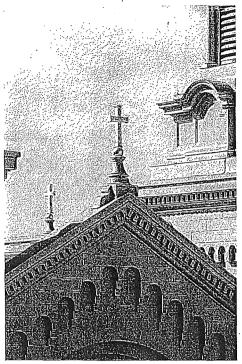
Cornice above main entry façade after restoration. (Rich Stapleton, 05/21/2018
